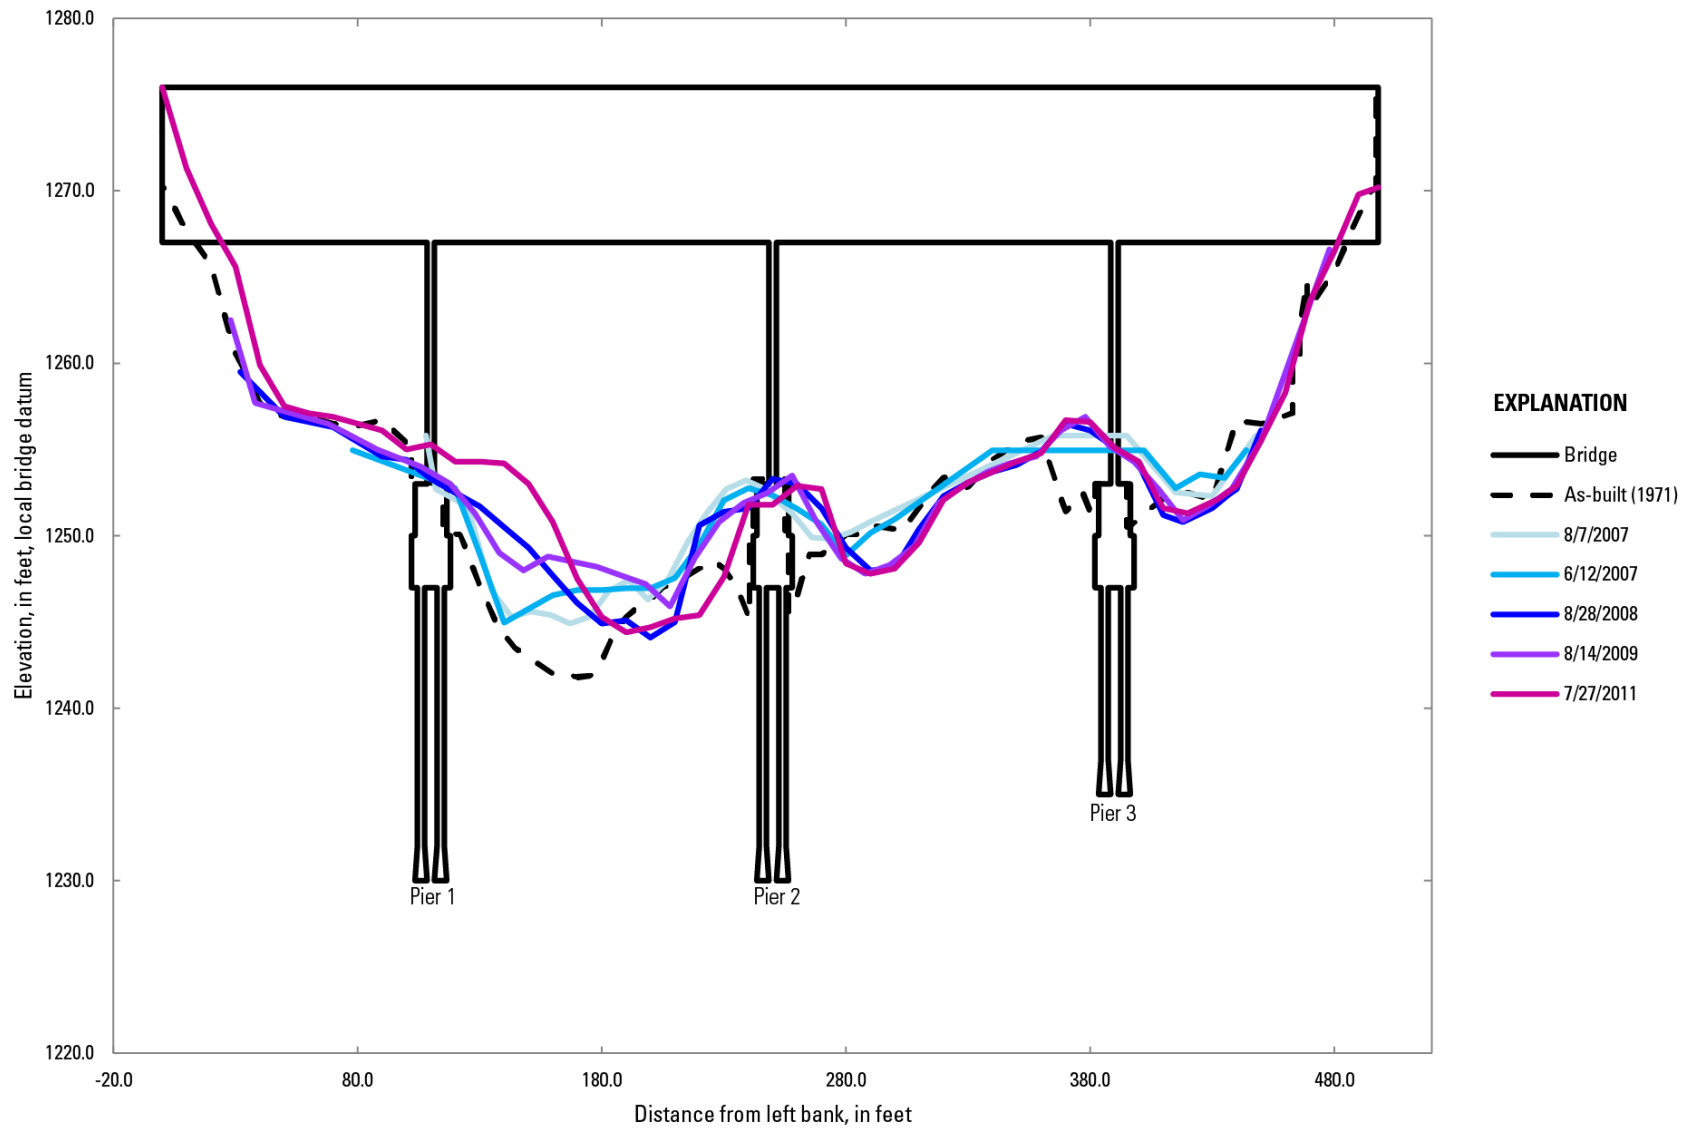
Cross sections showing downstream soundings at bridge 857, Nenana River at Healy, Alaska, 2007–11.
